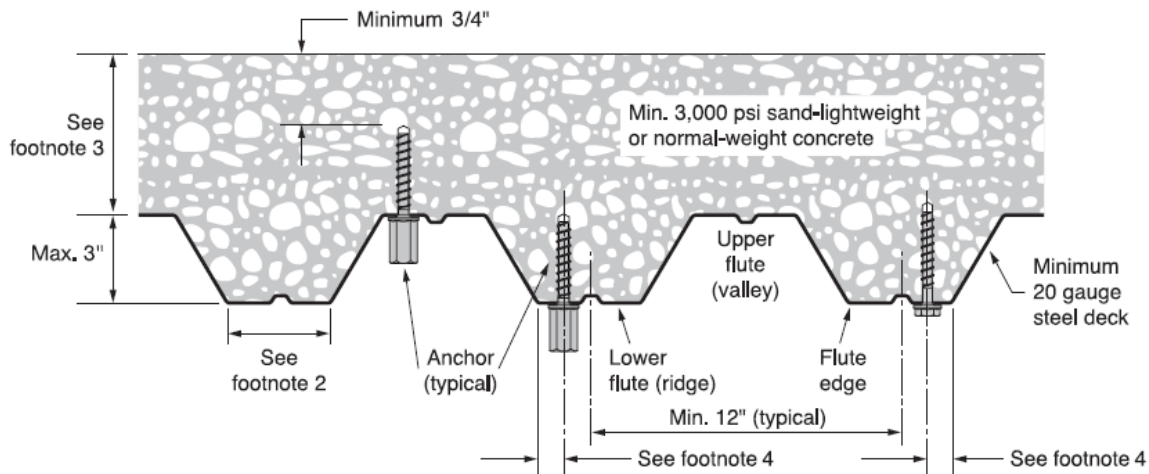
INSTALLATION OF KH-EZ, KH-EZ CRC AND KH-EZ I IN SOFFIT OF CONCRETE OVER STEEL DECK FLOOR AND ROOF ASSEMBLIES¹
